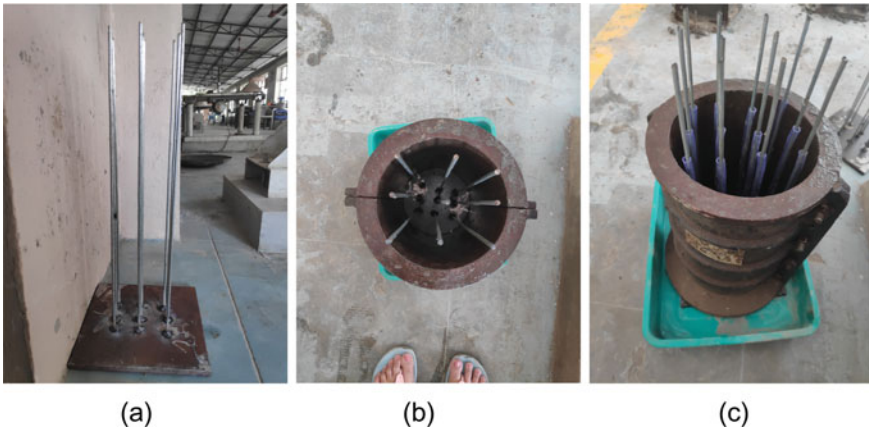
Mould prepared by welding steel rods on base plate
